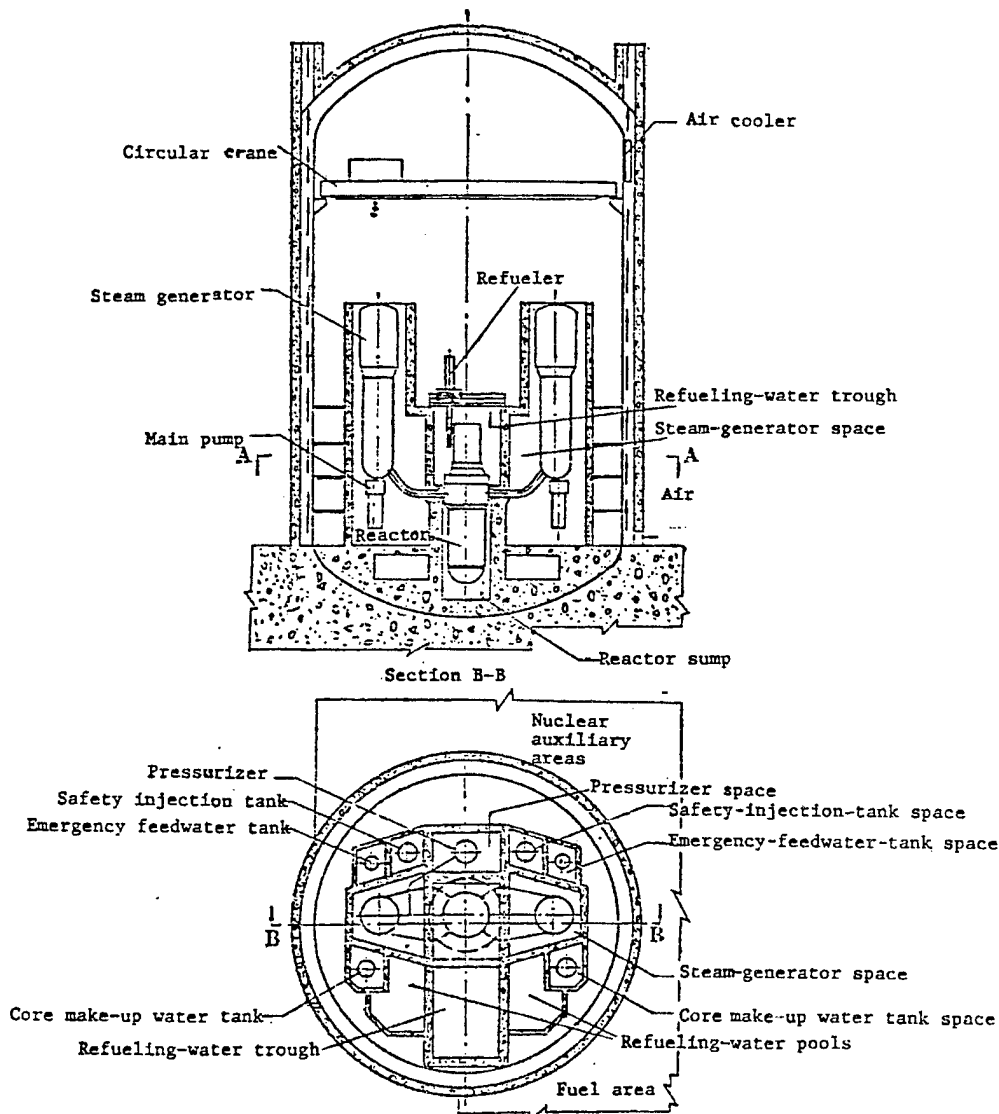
Cross-Sectional Diagram of AC-600 Plant Building
